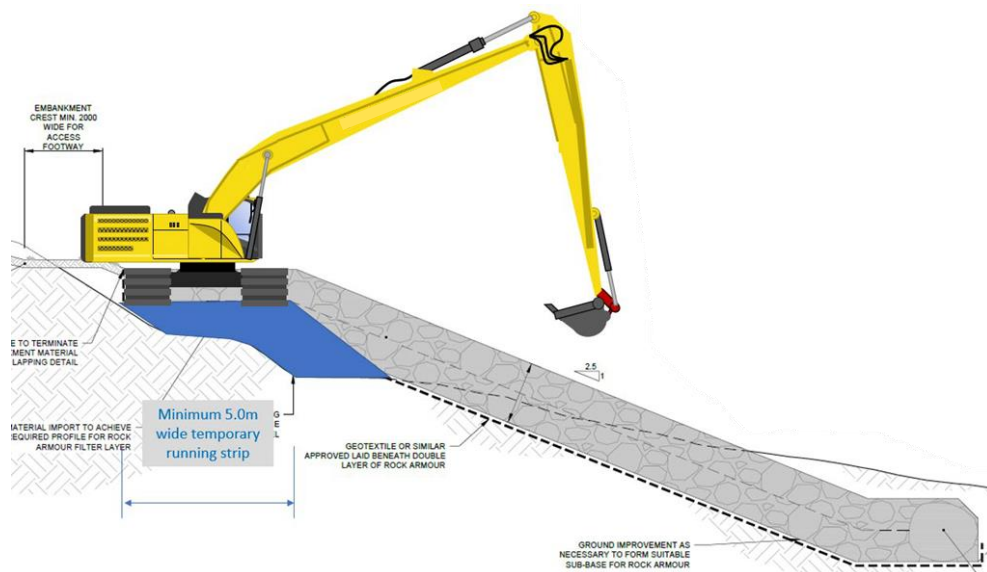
Typical construction arrangement for excavating and placing rock armour
